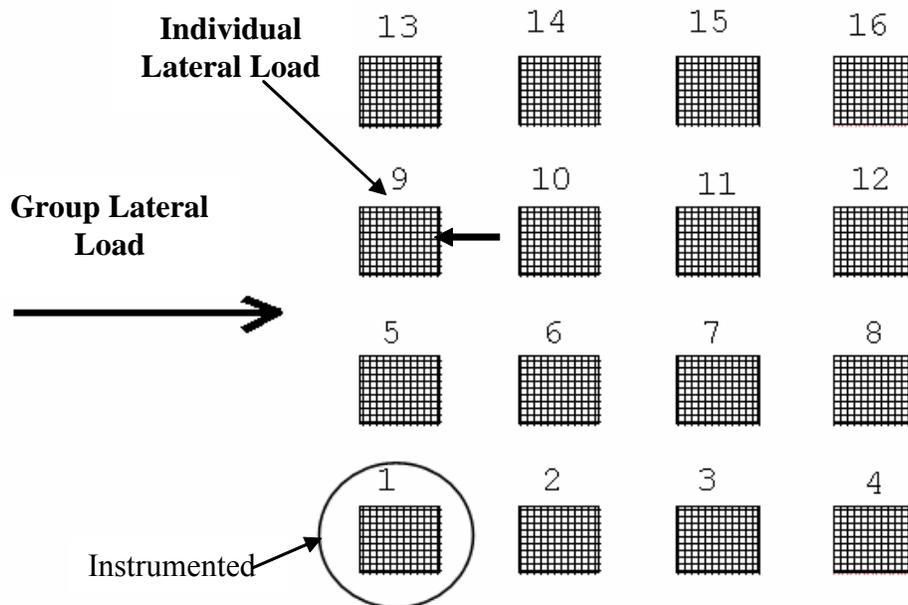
Schematic of 16 Piles at Roosevelt Bridge
